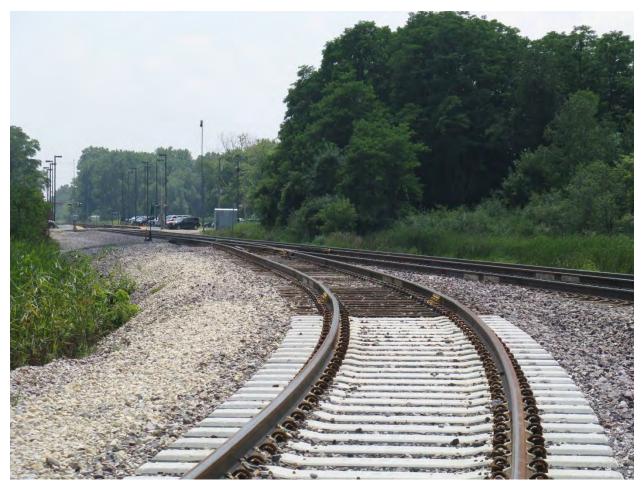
Junction of Zion On-site Rail Spur with Union Pacific Railroad Showing Concrete Rail Ties (2013)
